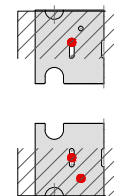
ANCHORING MINIMUM DISTANCE TO EDGE OF WALL
